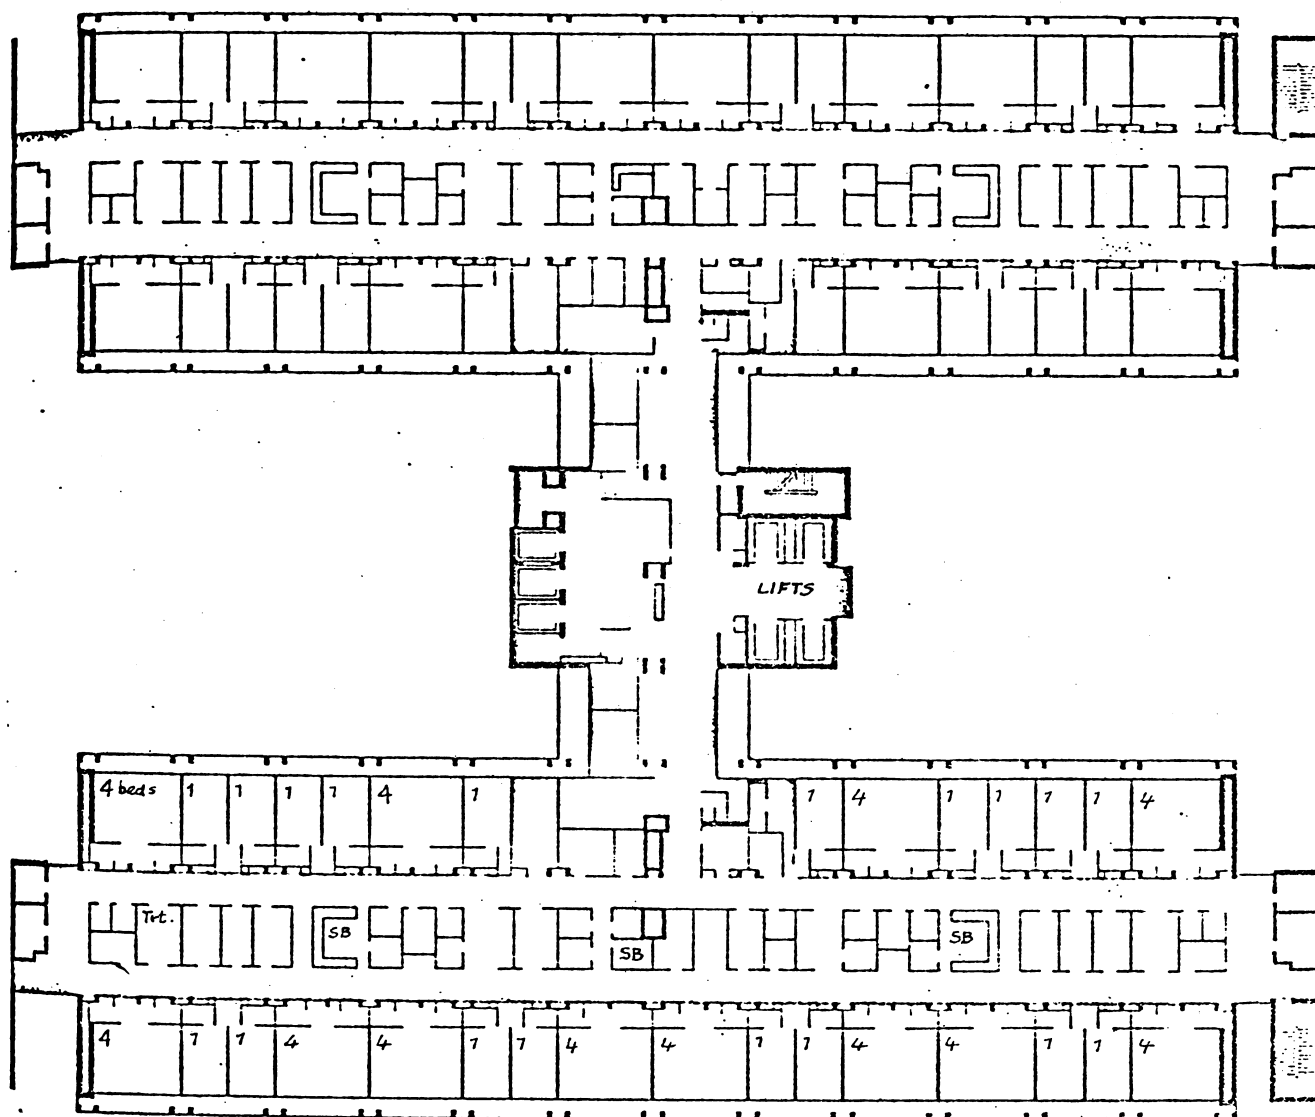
Ward floor layout at Westmead Centre, Sydney
